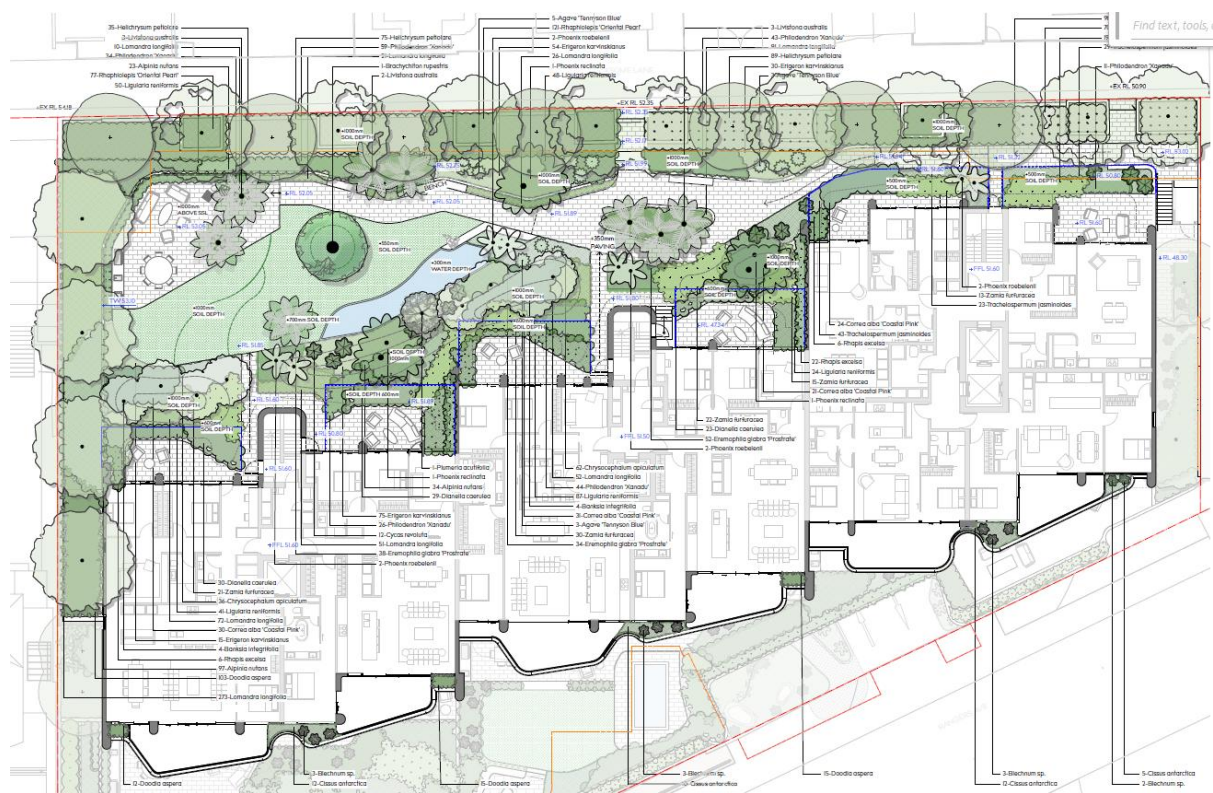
Updated Landscape plan showing substantial tree planting to the north and western boundary at Level 1
